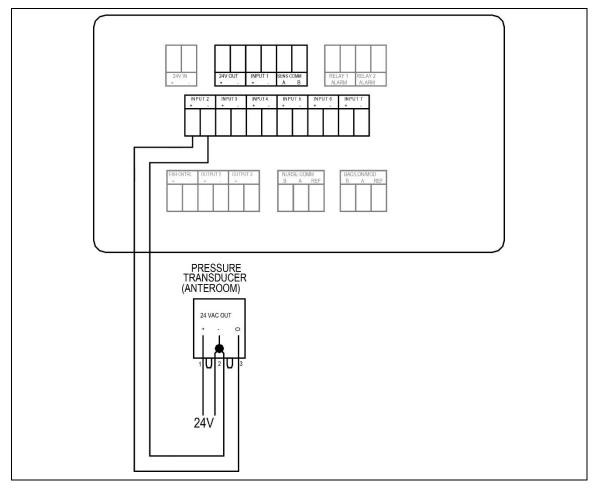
Optional Anteroom Pressure Transducer Sensor Wiring to Model RPC30
